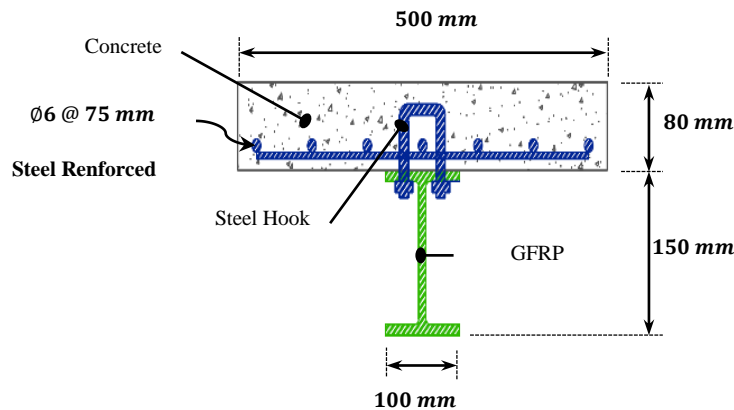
GFRP-concrete hybrid section geometry (dimensions in mm).
